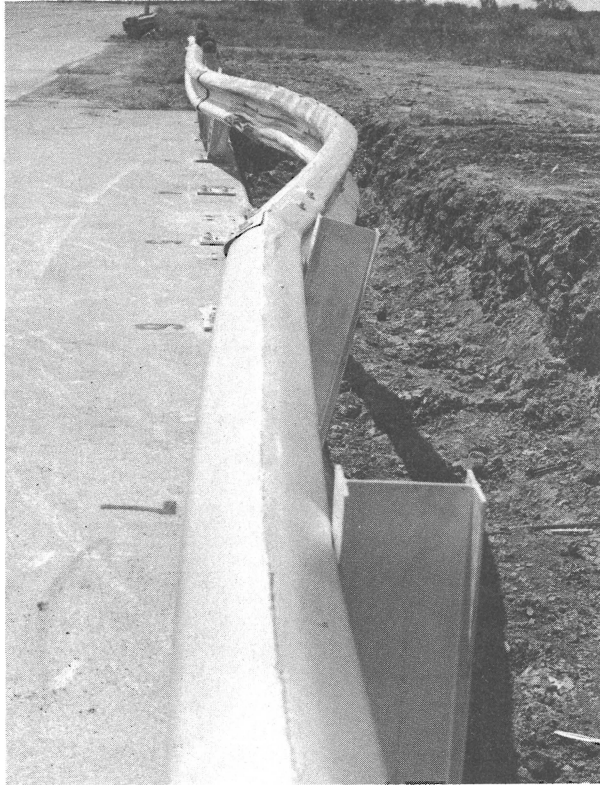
TUBULAR W-BEAM Bridge Rail after Crash Test 1B.
